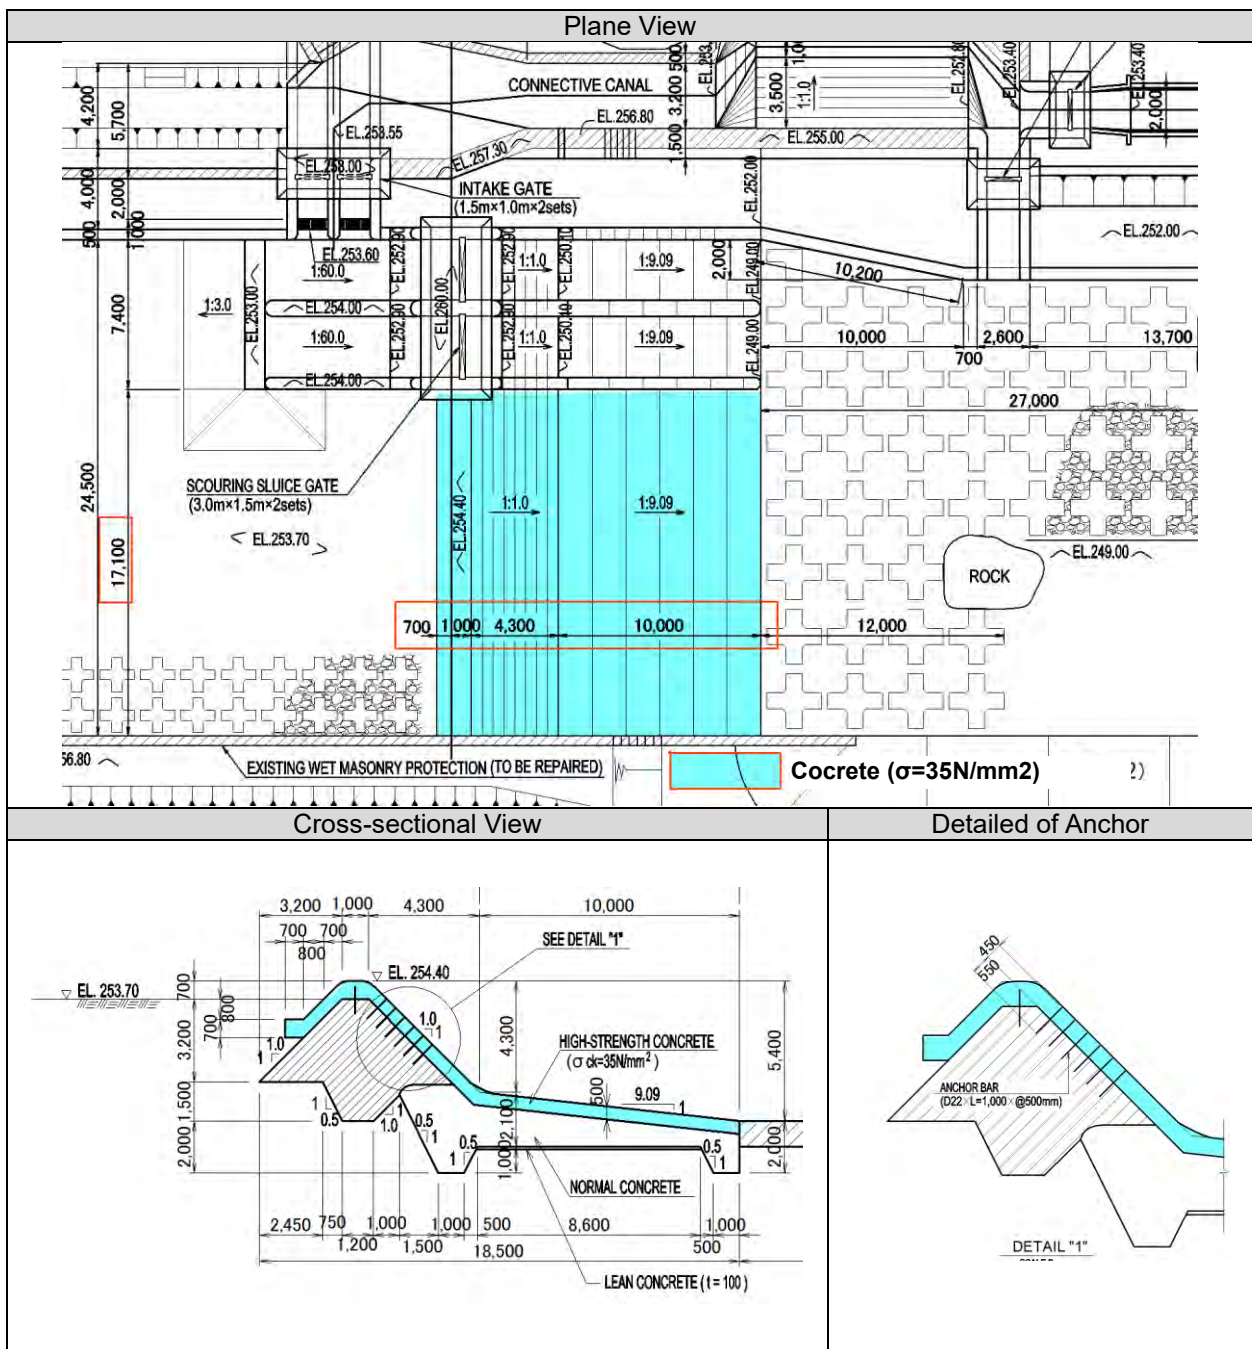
Rehabilitation plan of the bottom slab concrete of the main canal of the Buluto irrigation
